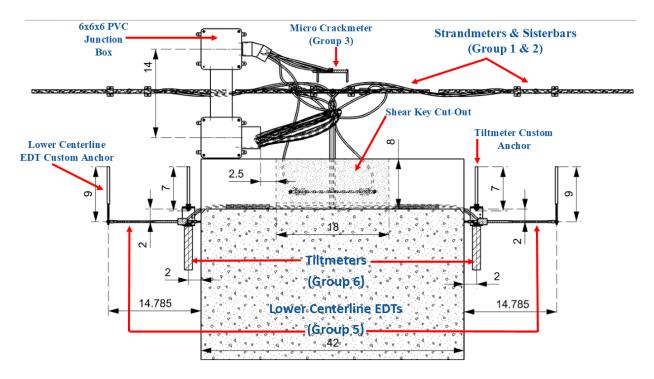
, Drawing, Bent Cap Side View (Slabs, Beams, and Parapets not Shown)
